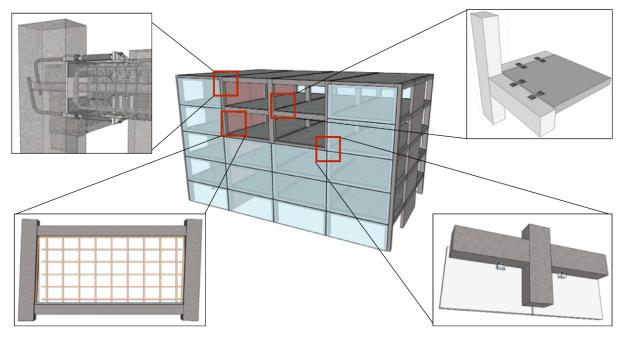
Five-storey PRESSS building with articulated floors and low damage non-structural element connections.
